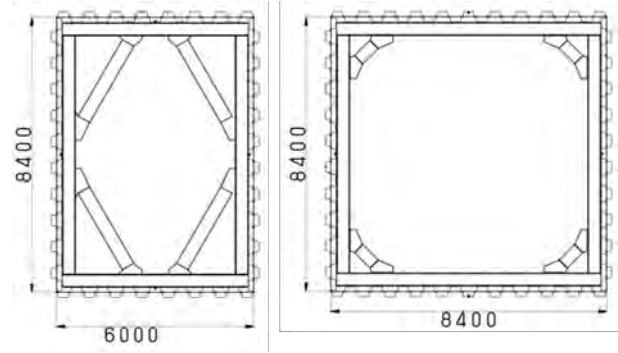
Pit 1 (Left),pit 2 (Right) (in mm)
